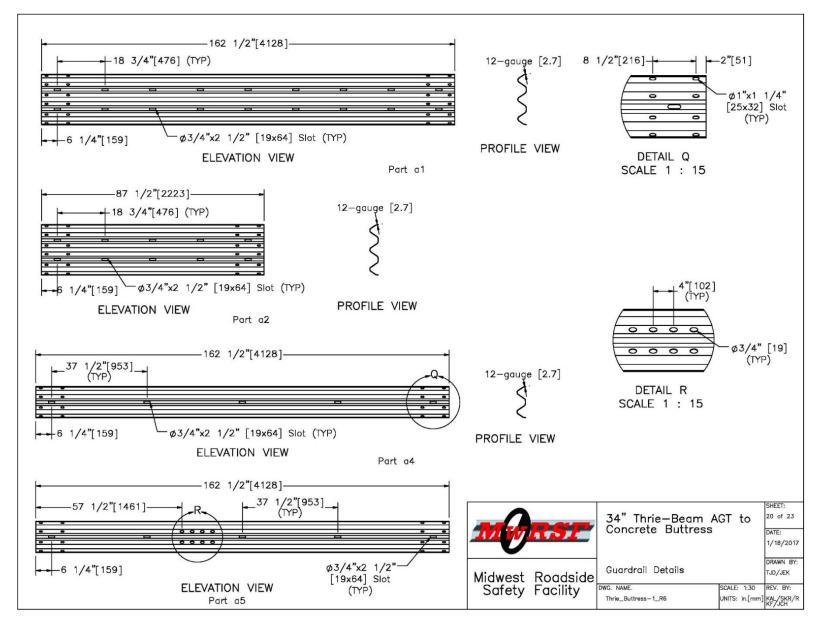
Guardrail Details, Test Nos. 34AGT-1 and 34AGT-2
